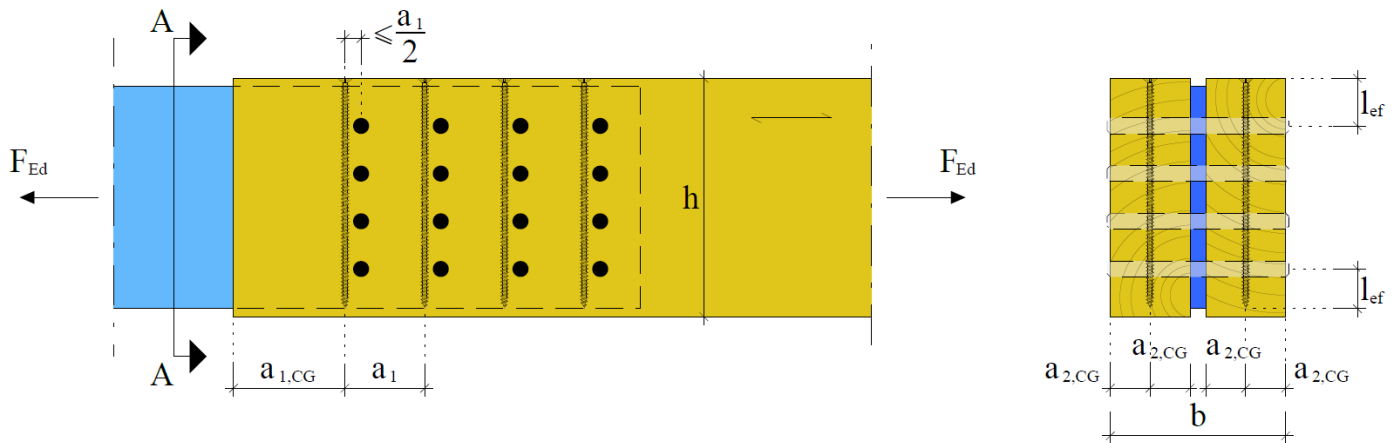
Dowelled steel-to-timber connection with outer timber members and reinforcement;
